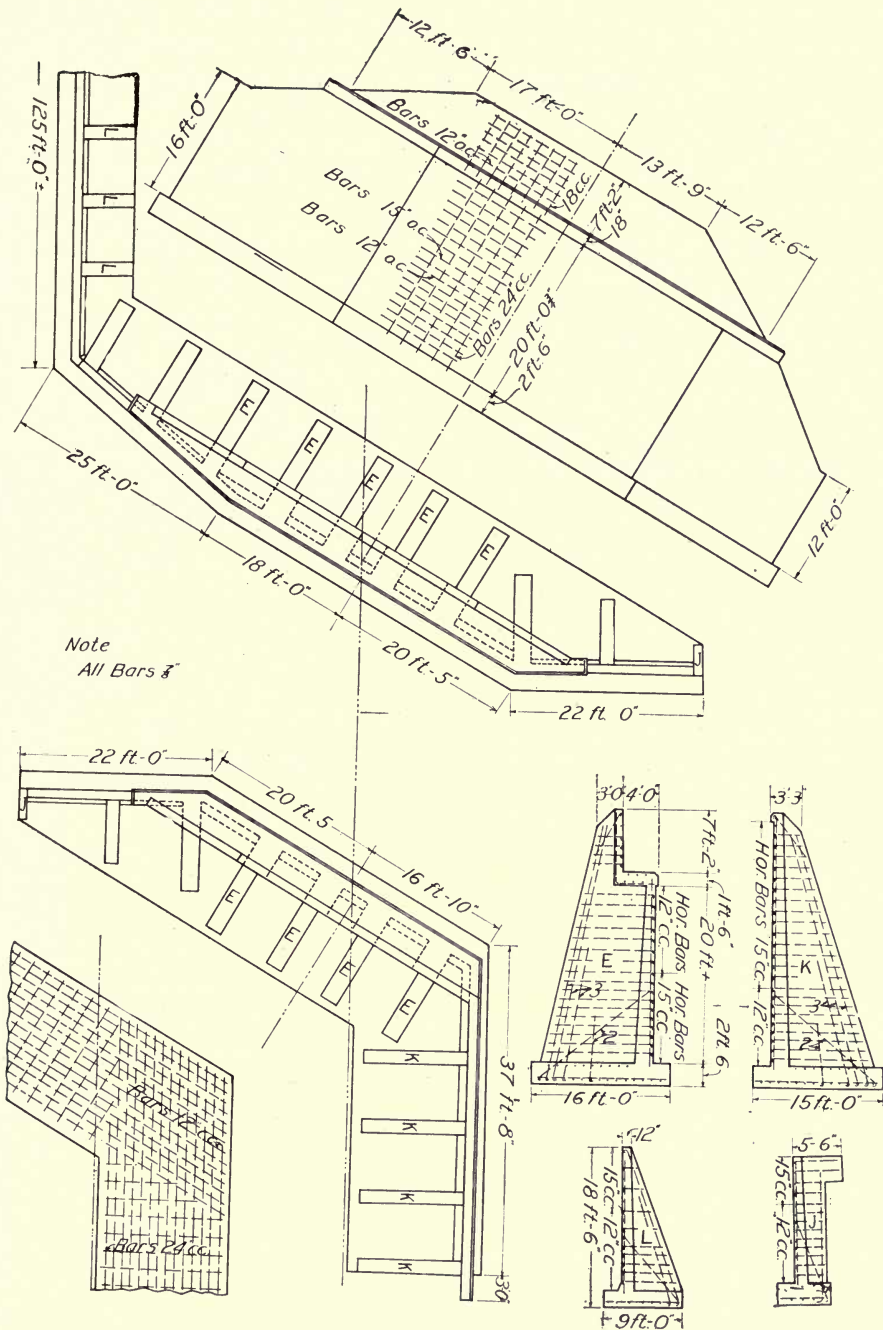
THIRD STREET ABUTMENTS, K. C., M. & O. RY.
